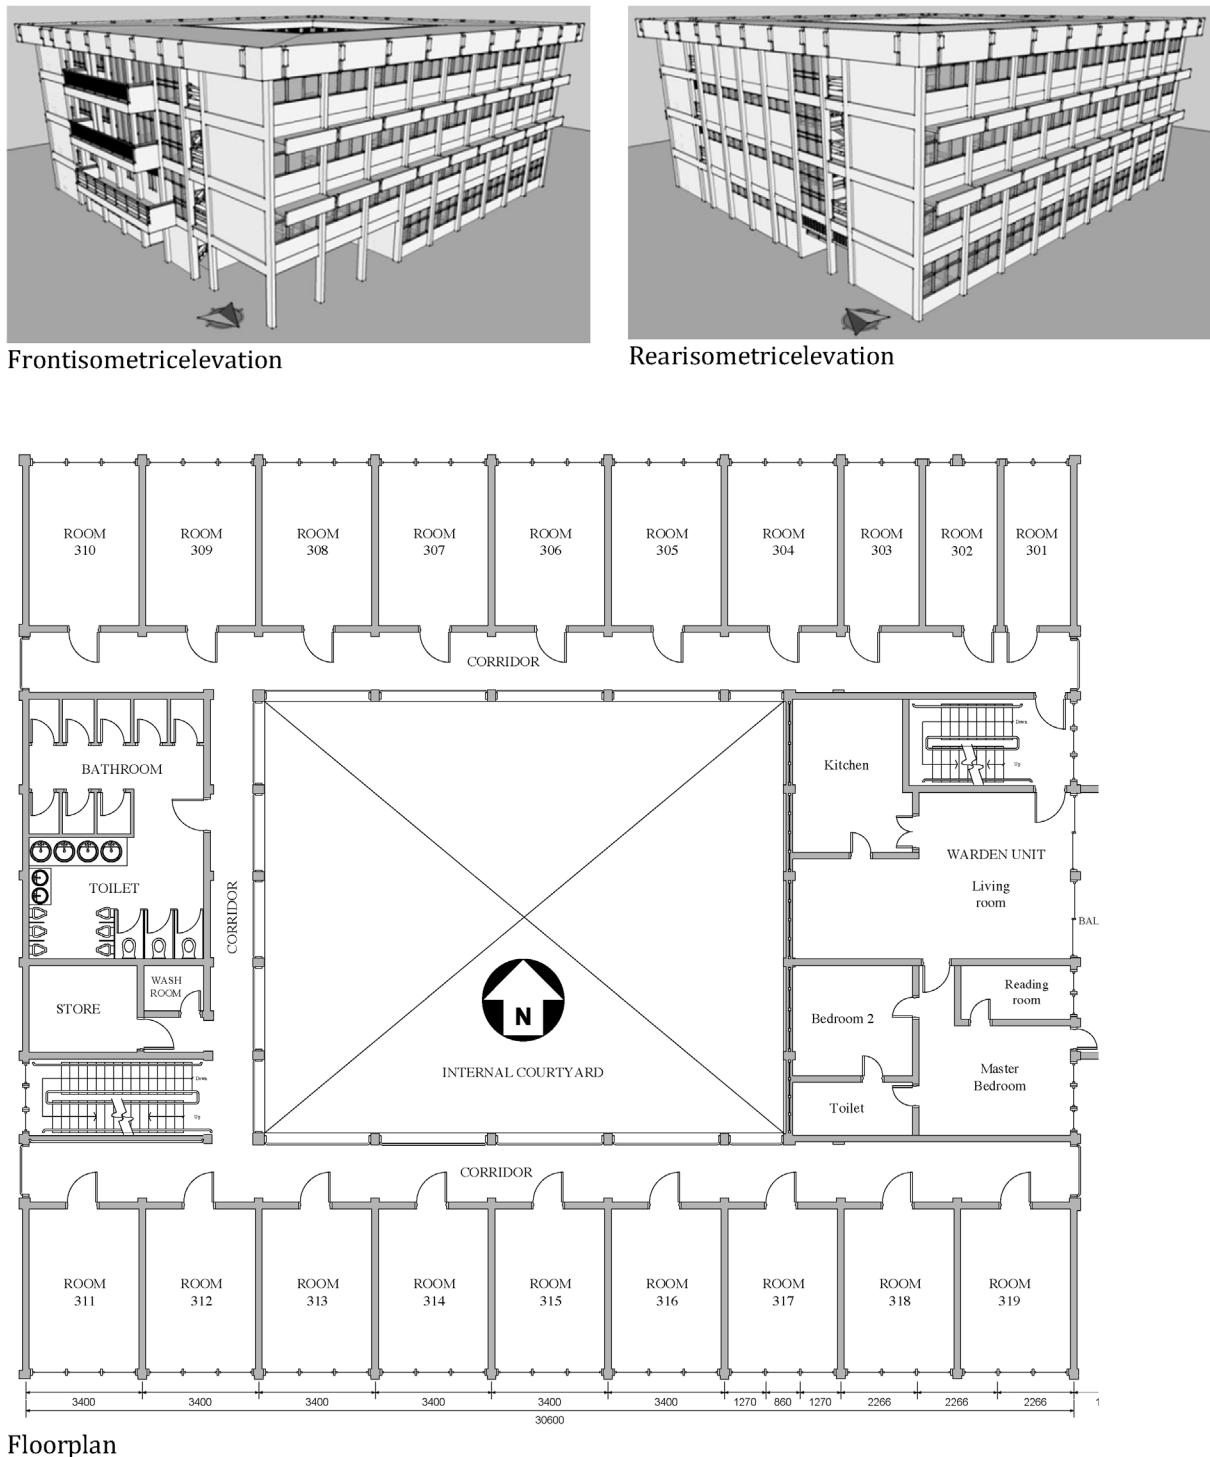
Typical elevation and floor plan of the Dayasari RC building.
